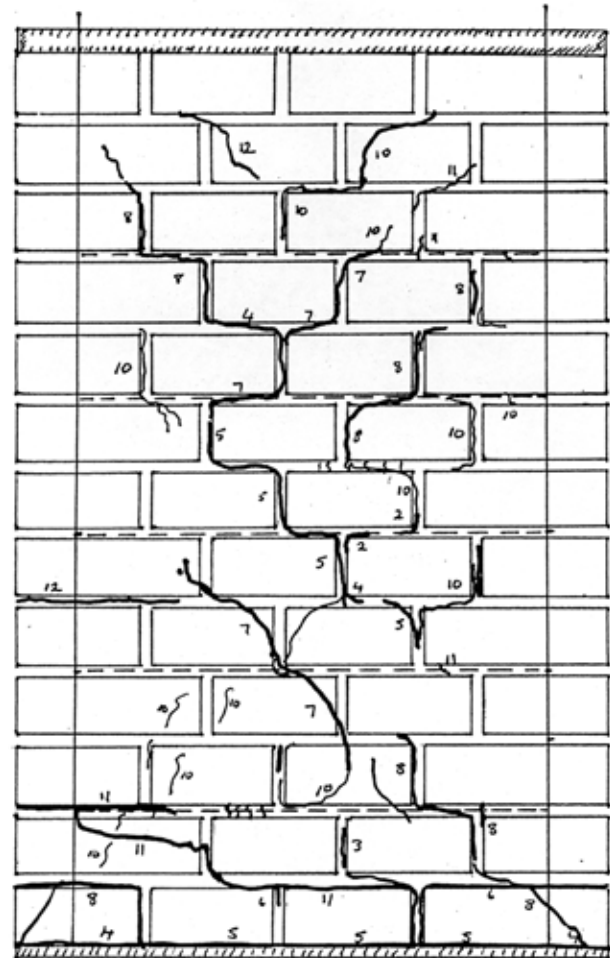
Crack pattern of an adobe wall, showing the load progression.
